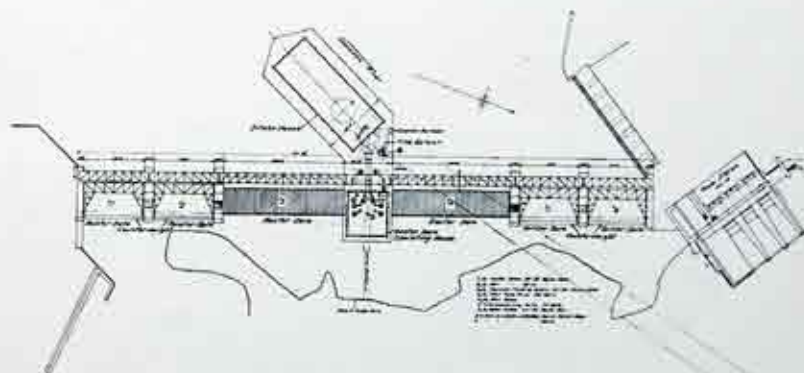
Plan showing intake house, dam and Station 15. Dotted lines indicate tunnel which goes to Station 5
